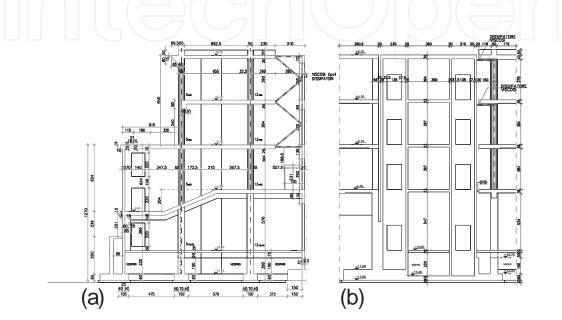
Nonlinear viscous damper placement: a) transversal; b) longitudinal.
